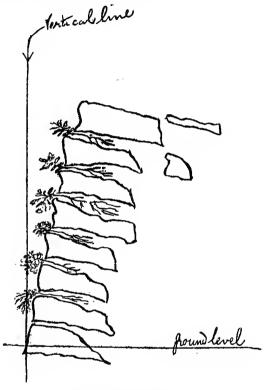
Section showing the principle of arranging Stones in Dry Walls.
